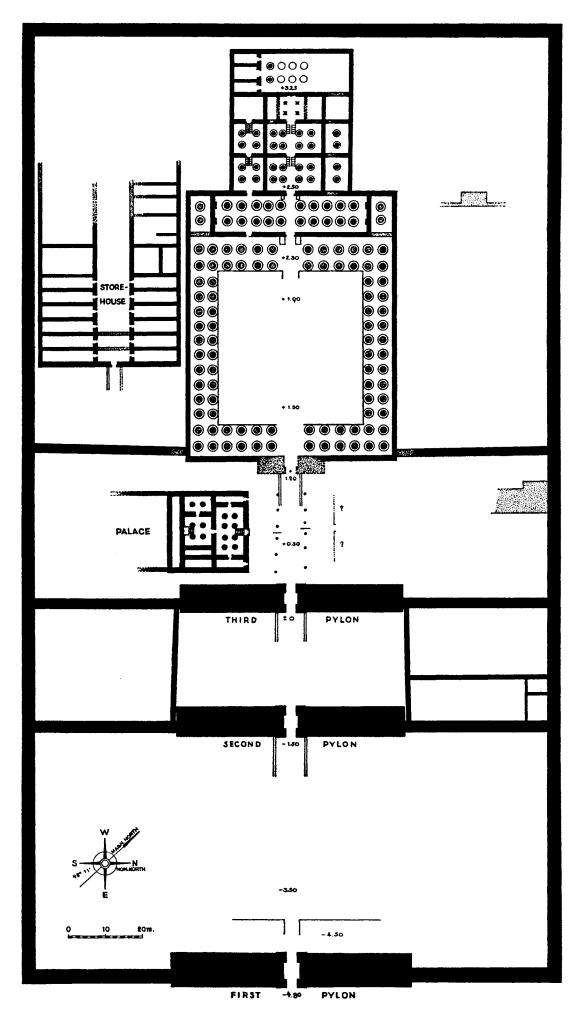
Ground Plan of the Temple of Harmhab. Reconstruction. Scale, 1:1,000
